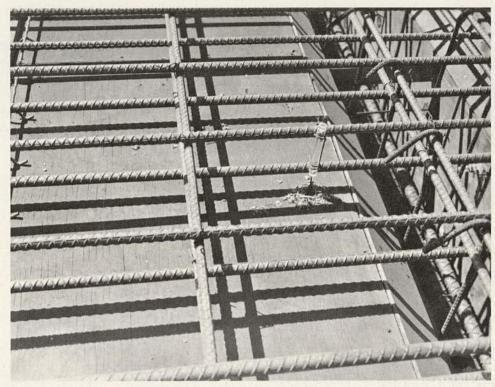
Reinforcement in concrete beam bridges; thermocouple on steel.
